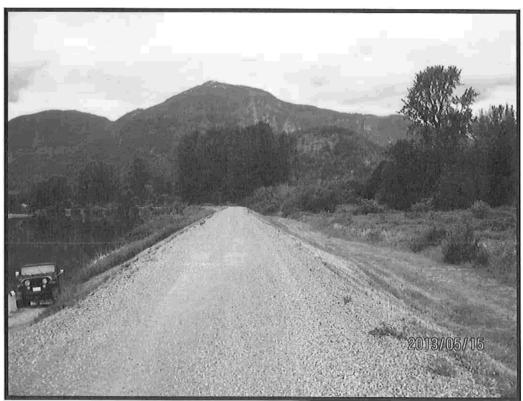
Looking west at Dike C from the Hamilton Road crossing (May 15, 2013)
